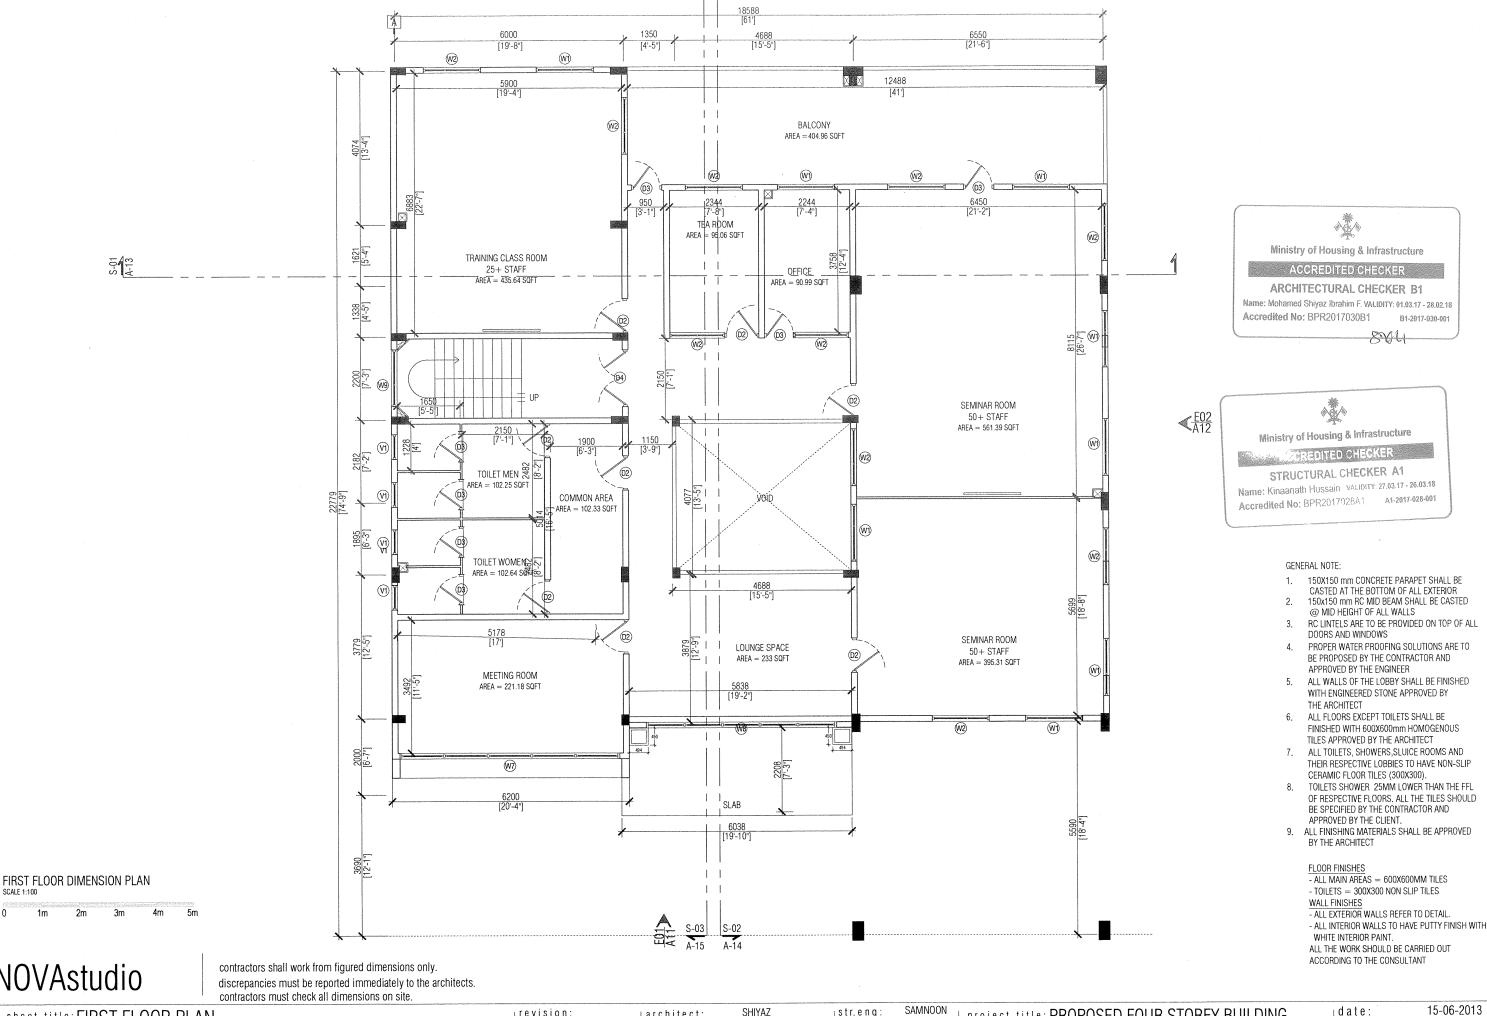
DETAILED DESIGN, ARCHITECTURAL DRAWINGS
